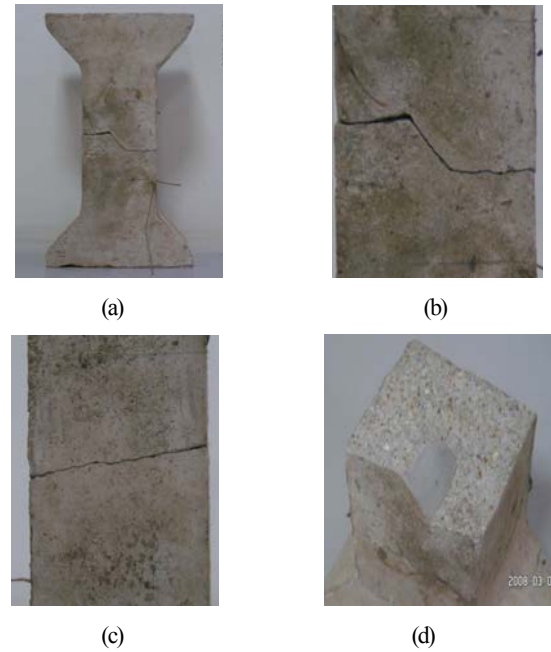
Failure states of sample with  $\alpha=30^\circ$ . (a): Fractured sample; (b): Fracture trace on front surface; (c): Fracture trace on back surface; (d): Fracture section
